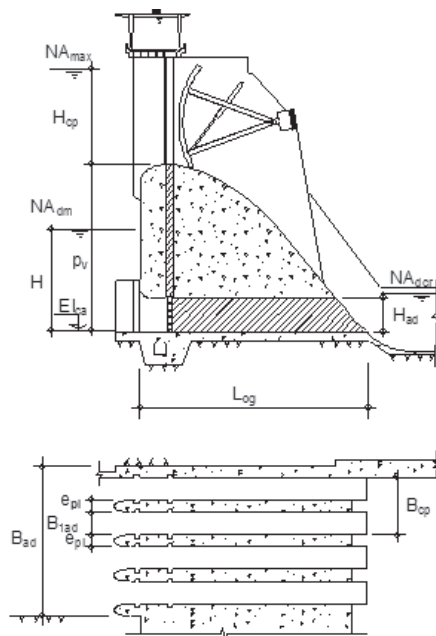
Typical cross-section and plan for sluiceways through a spillway with a high ogee crest and a stilling basin.
